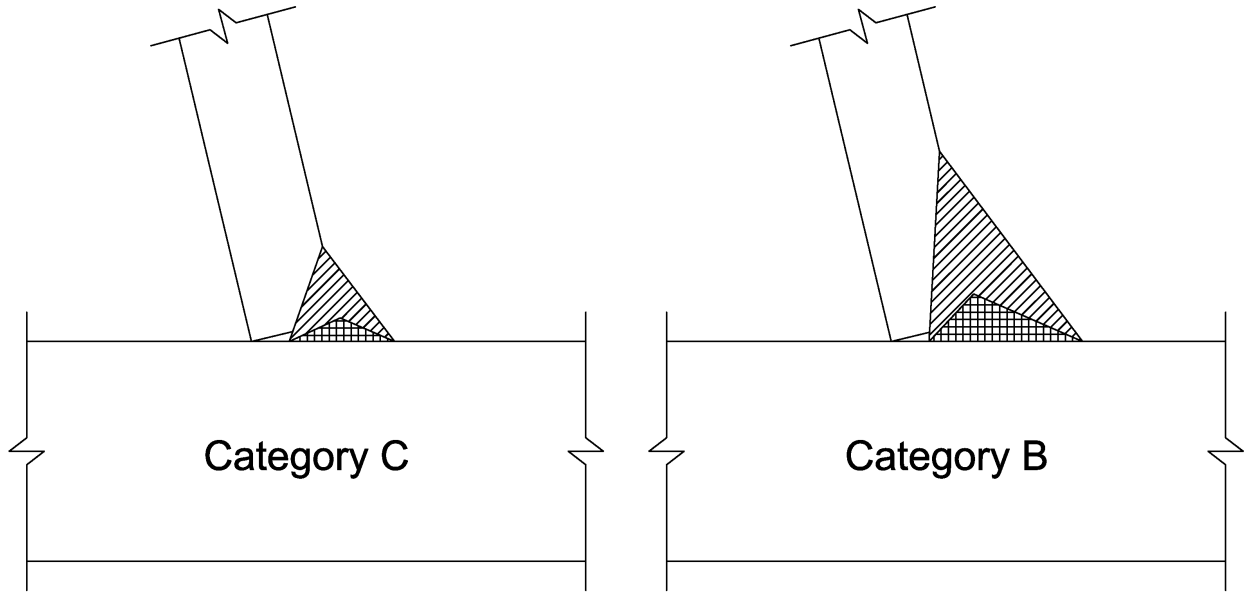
Illustration. Comparison of minimum weld dimensions for categories C or B fatigue design.
